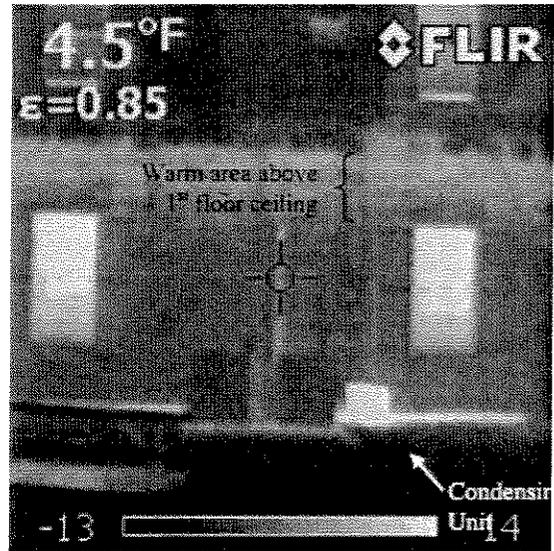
Bright windows indicate heat leakage. Lighter band at ceiling of 1st floor up to second floor is an indication the blown in insulation is settling, uninsulated floor framing, and a warm ceiling plenum above 1st floor ceiling. The condensing unit is rejecting heat from the server room.
